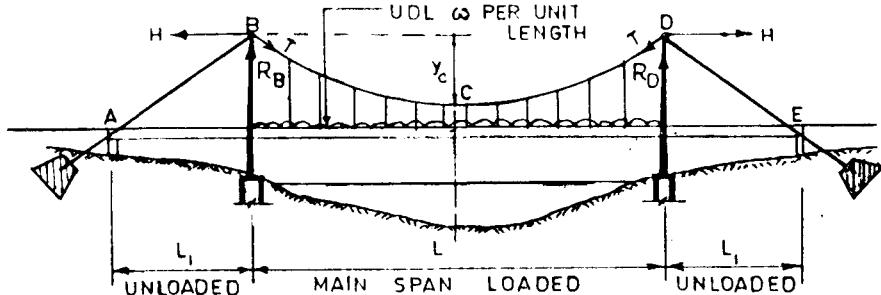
·20 CABLE TENSION IN A SUSPENSION BRIDGE
